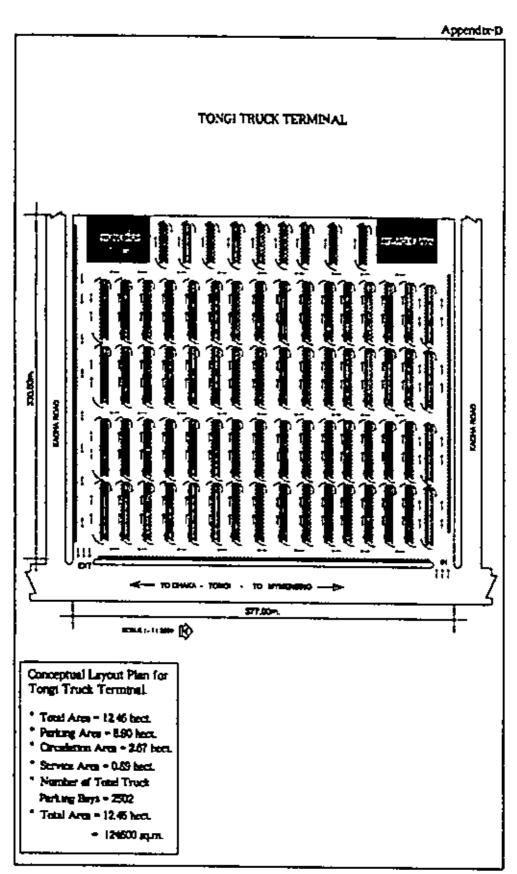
Conceptual Layout Plan for Tong: Truck Terminal
